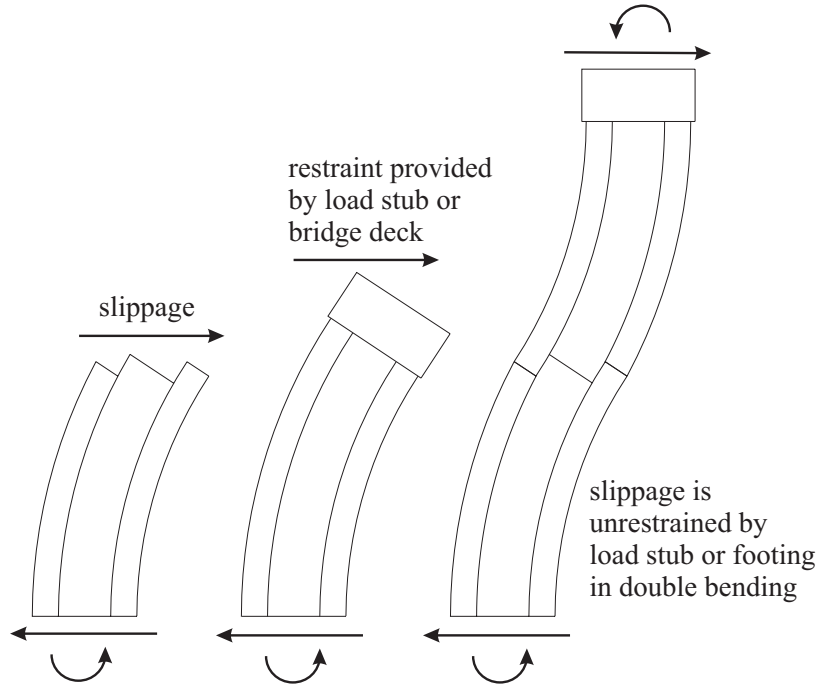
Slippage between the boundary elements and the wall caused by shear.
